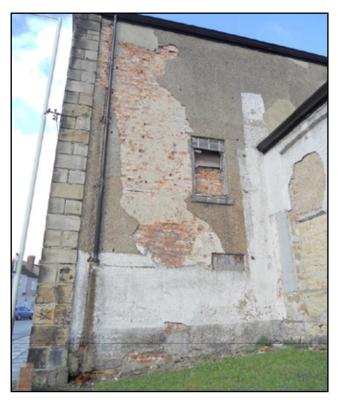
The south elevation of the 'Cottage' with blocked doorway to the right. Reproduced by kind permission of Head of Steam Railway Museum, Darlington.
